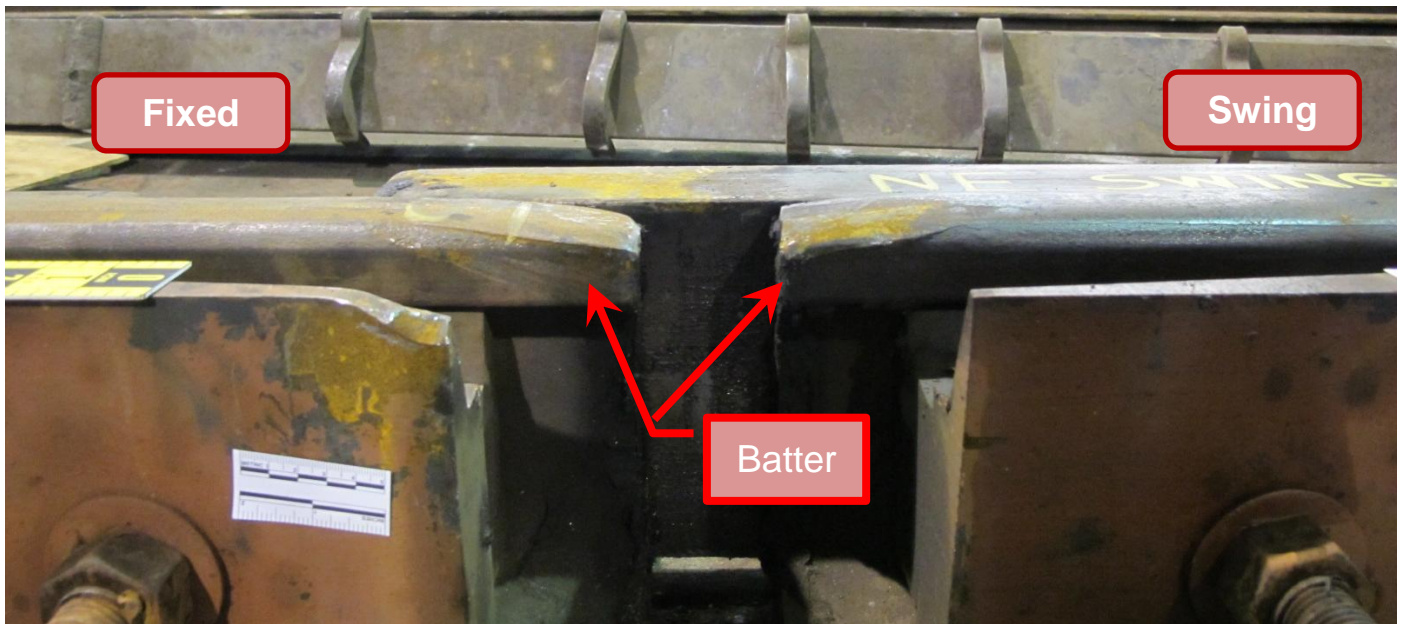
Side view looking east at the rail end battering on the running rail at the at the north bridge end gap. East rail shown, also typical of the west rail.
